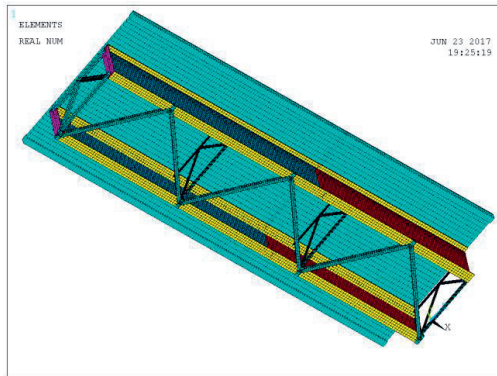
Bridge segment, from beneath, horizontal D-truss, RHS 200 x 200 x 10
